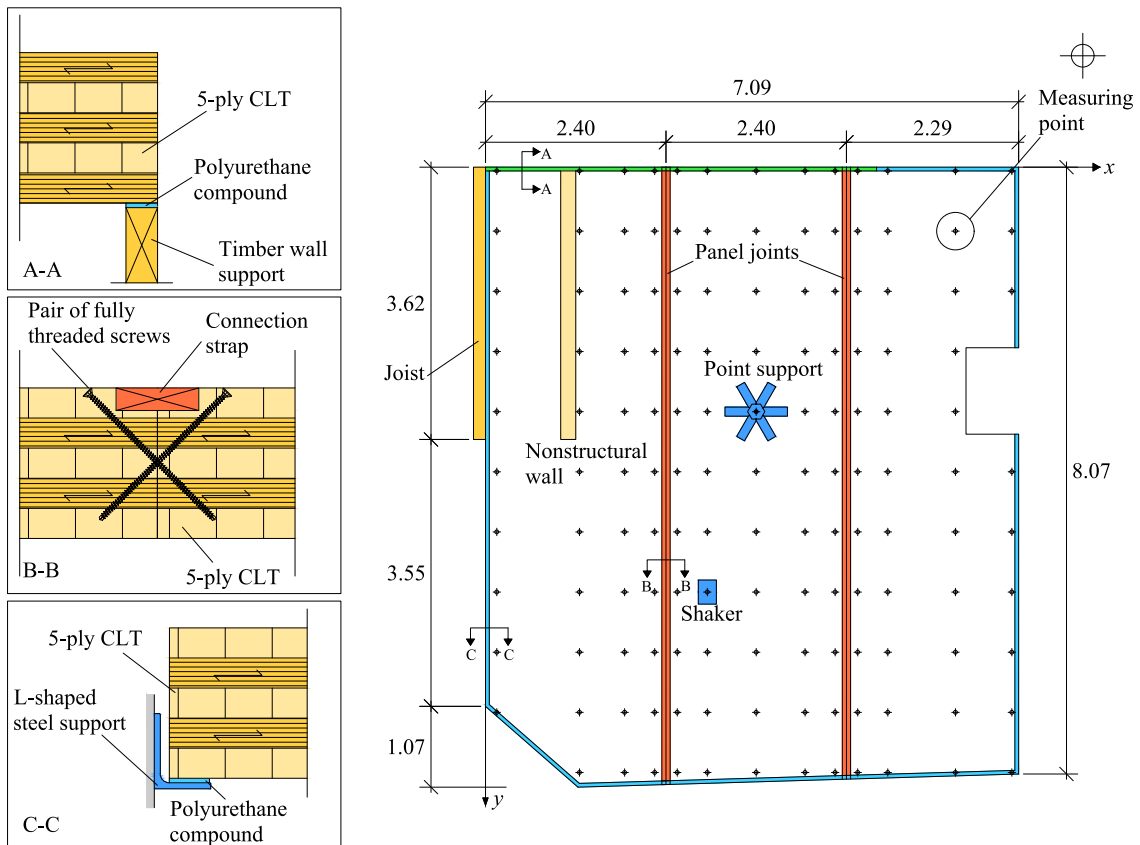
Floor plan of the CLT slab, boundary conditions and construction details.
